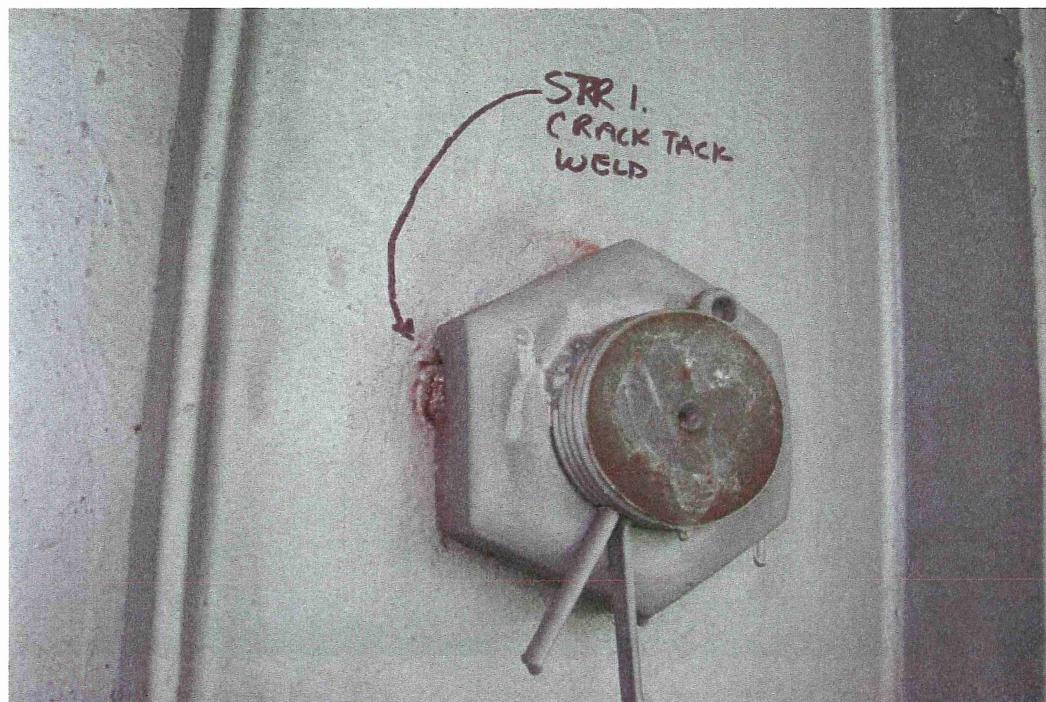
Span 9, Stringer 1, crack tack weld between nut and hanger. Looking North.
